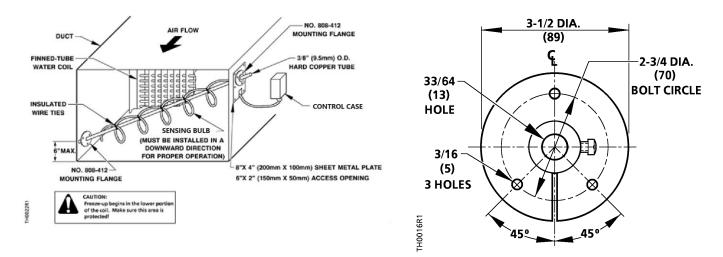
Bulb Mounting for Limited Access Ducts with Mounting Flange.
